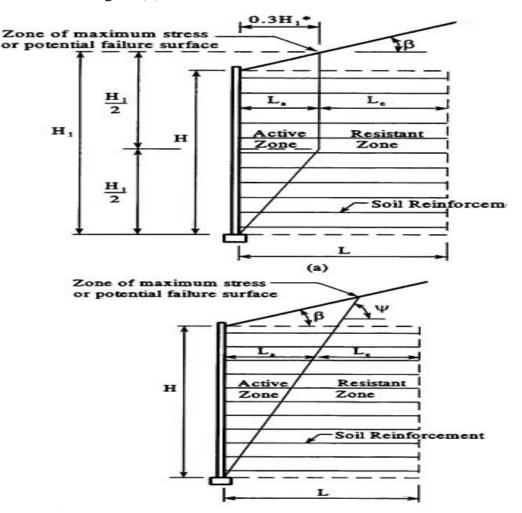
; Location of Potential Failure Surface for Internal Stability Design of retaining Walls (a) Inextensible Reinforcements and (b) Extensible Reinforcements.
